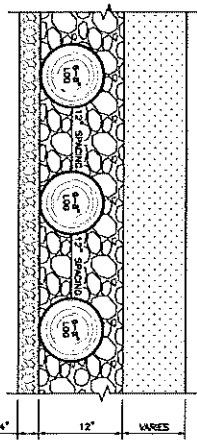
DETAIL - BANK PROTECTION - COMPOSITE ROCK WOOD
